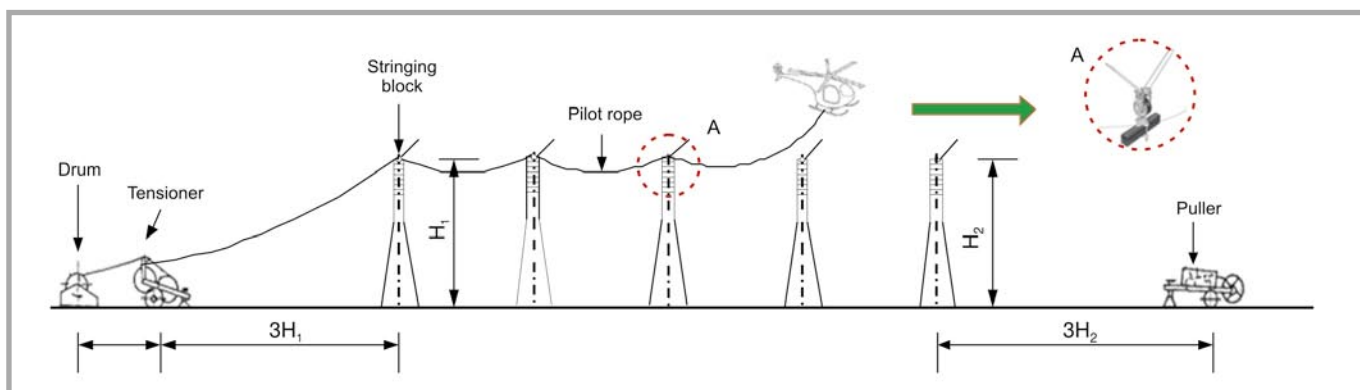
The stringing conductor scheme with special cradle block to wire installing (K. Frymer)
